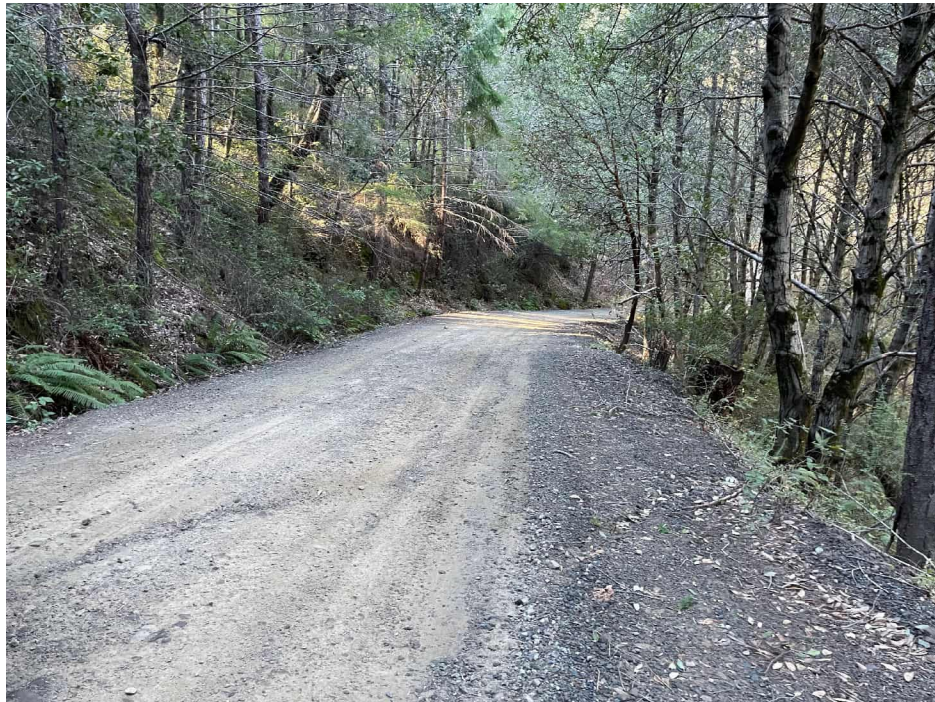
RP 5. Milky Way Loop – 14-16' dirt/gravel road width below waterbar. Image shown facing north; towards Highway 101.
